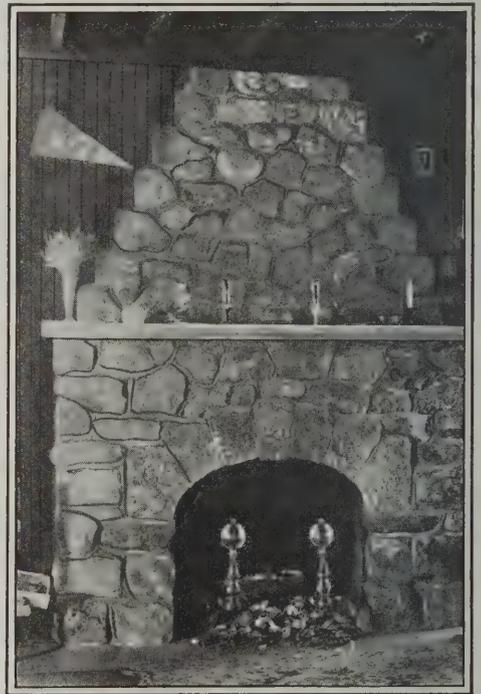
An Open Fireplace and Chimney Breast Constructed of Field Stone
